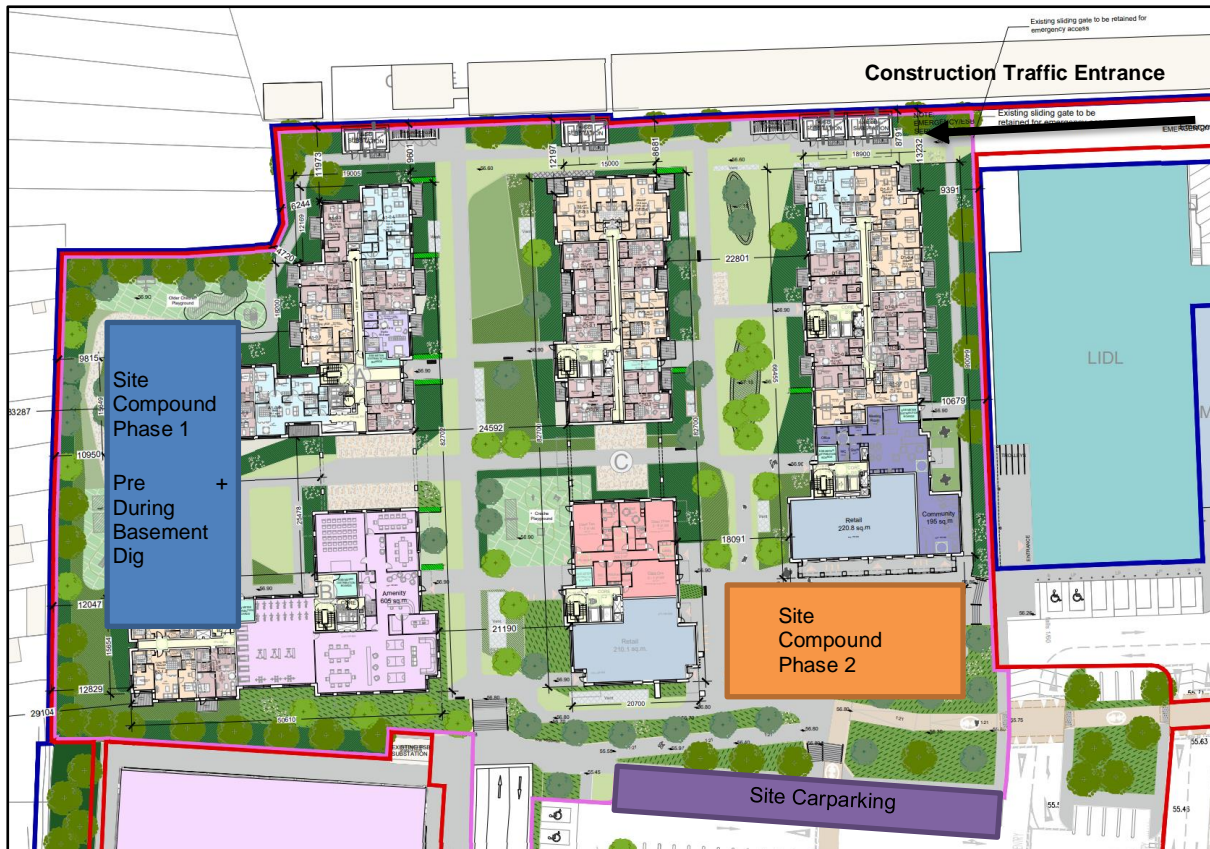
Proposed Site Compounds & Staff parking Locations
